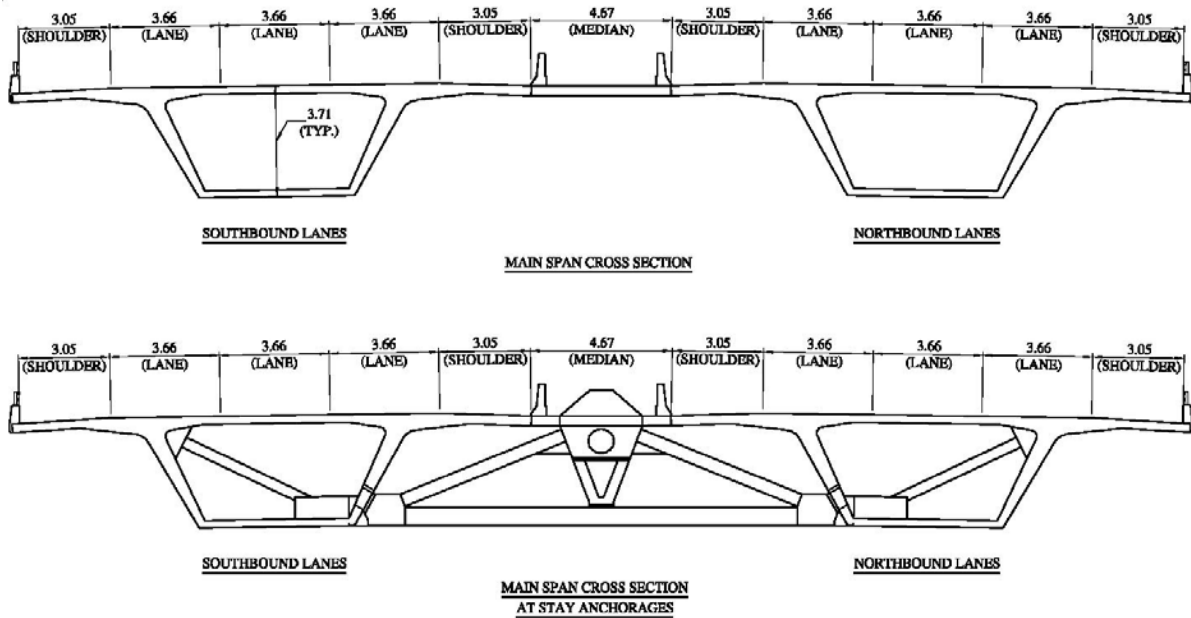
Main span typical cross-section and cross-section at stay anchorages (all units m).
